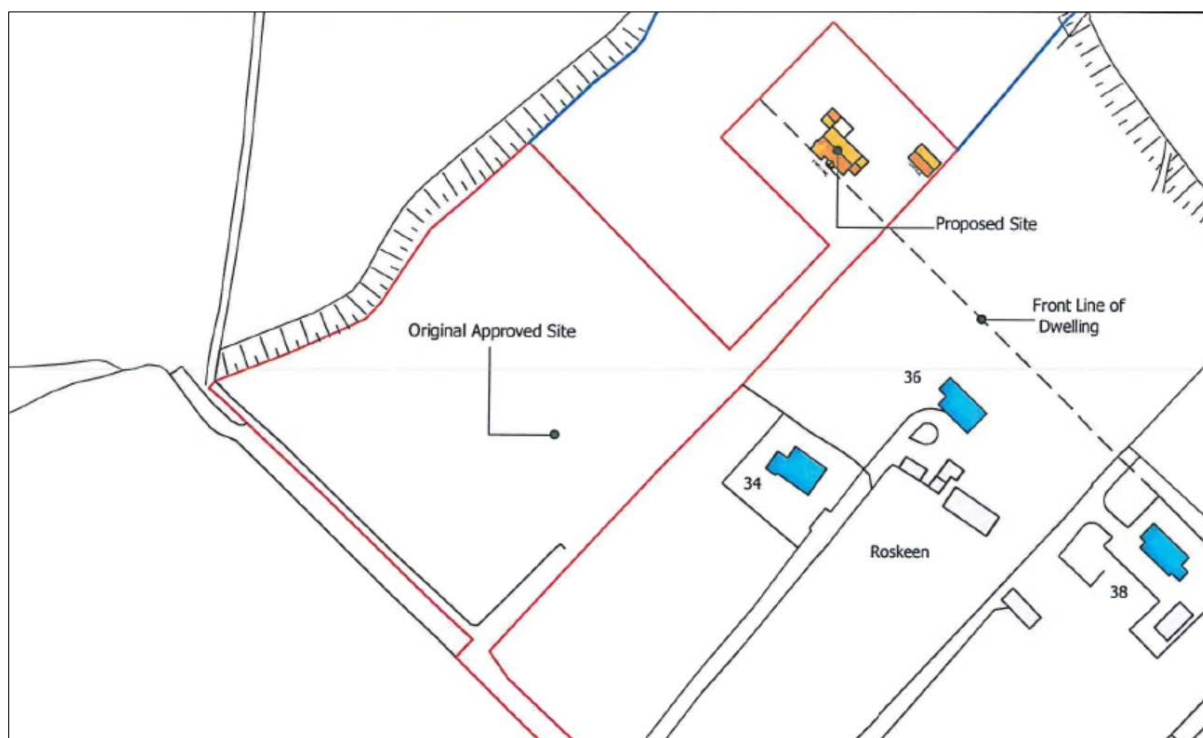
Current site location plan showing approx. location of previously approved dwelling and garage; and location of the change of house type including garage proposed.
